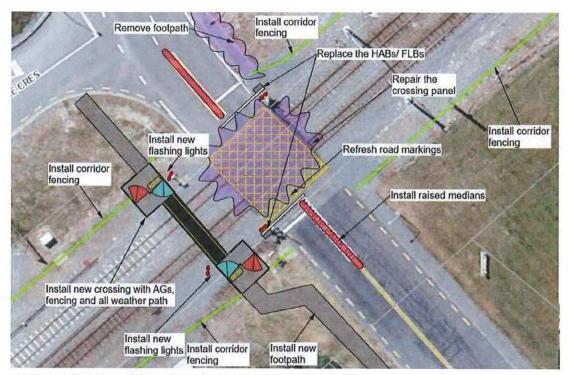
Recommendations for the Manor Park Road Level Crossing
